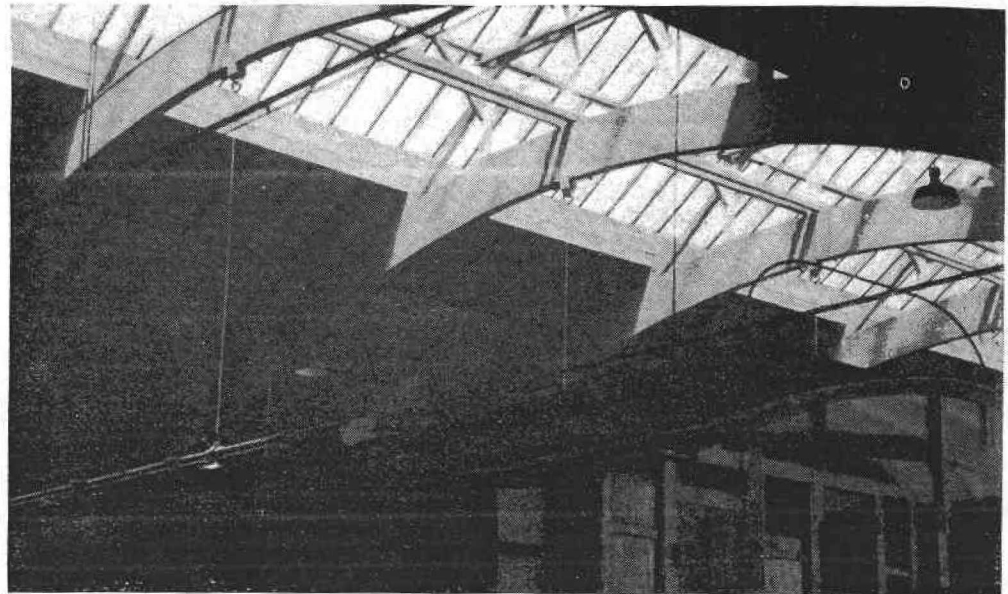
Outer face of end bent railway station platform roof, Trondhjem, Norway (same structure as shown in fig. 11): *A*, slight opening of longitudinal joints; *B*, imperfect longitudinal joint near butt joint in lamination.
